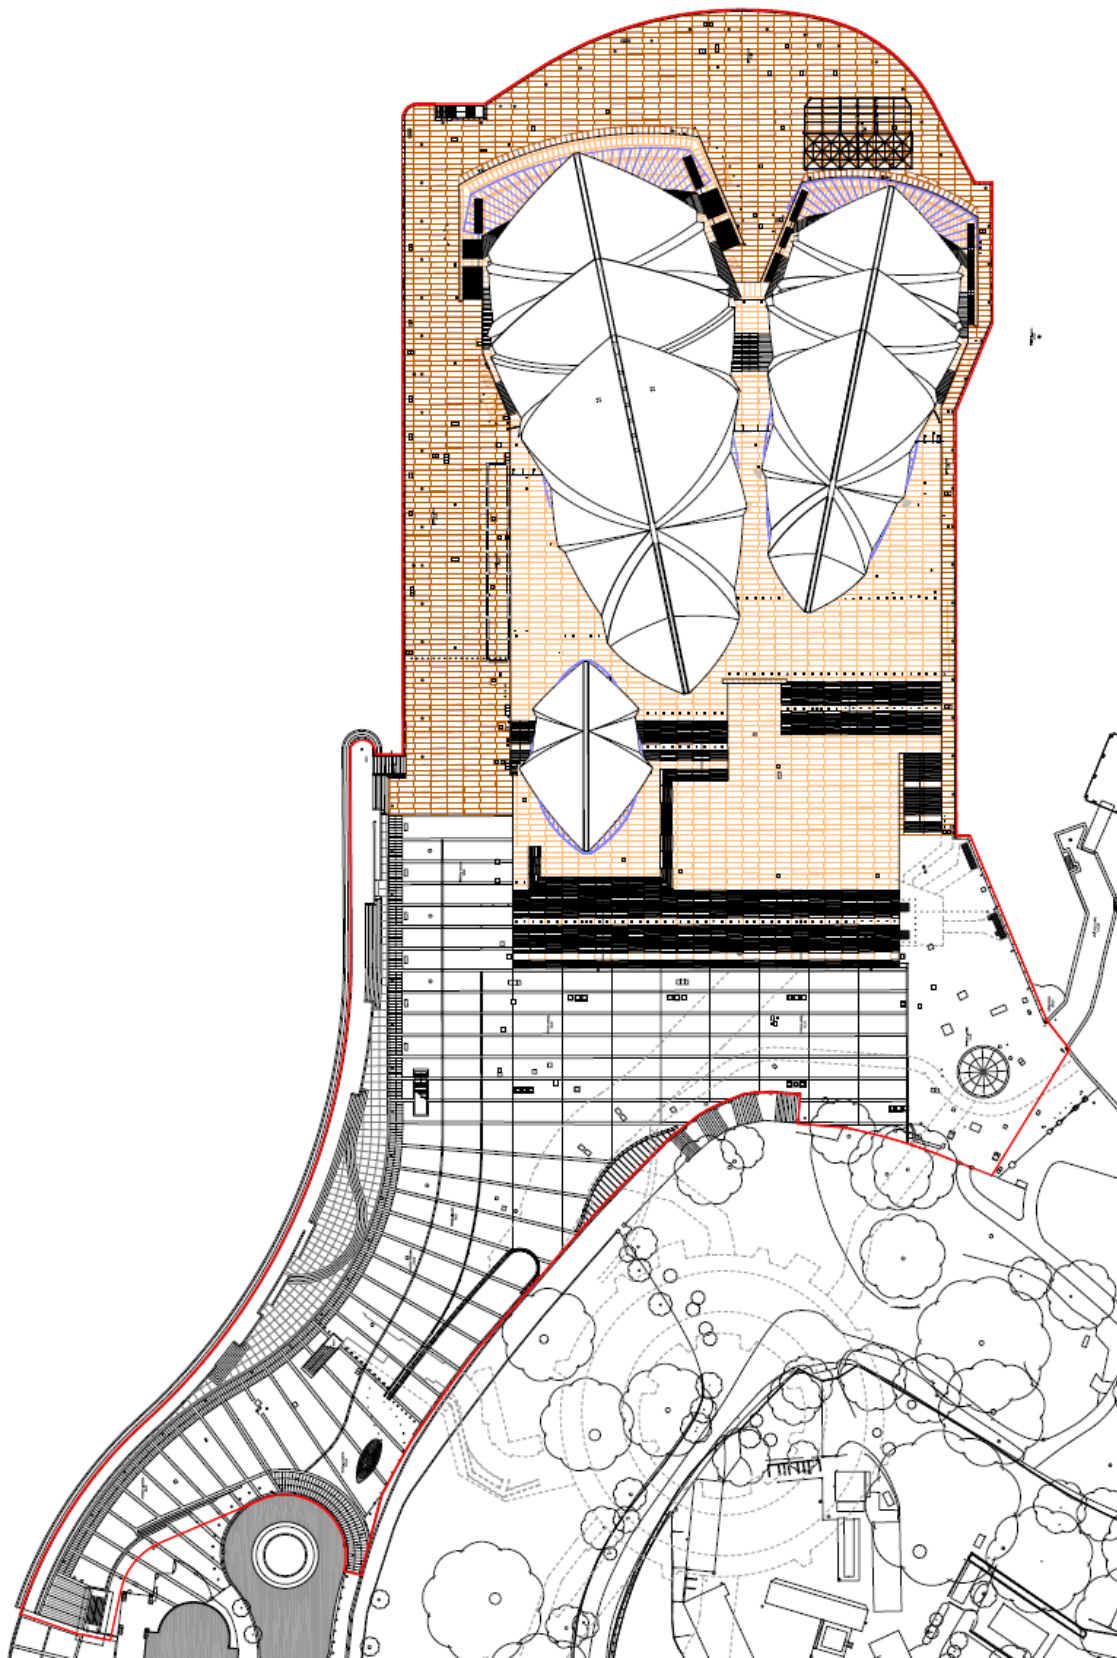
Sydney Opera House Site Plan (source: Sydney Opera House Trust)
